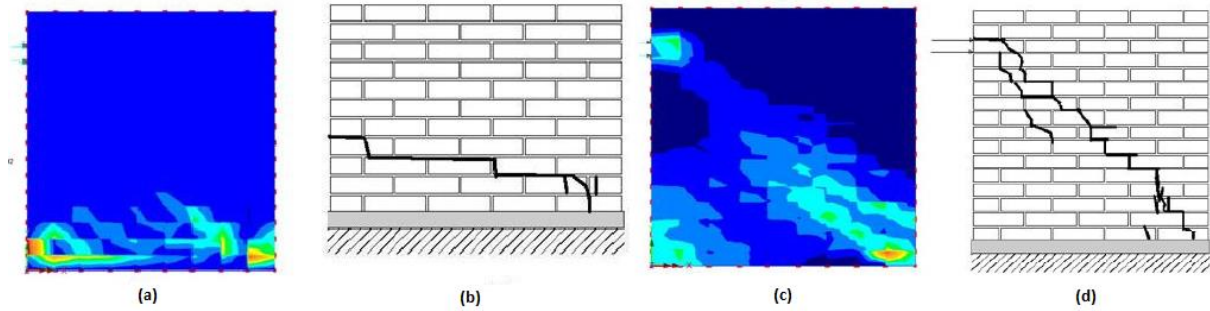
(a) maximum strain in URM (b) crack pattern experimental testing URM (c) maximum strain GFRP reinforced masonry (d) crack pattern experimental testing GFRP reinforced masonry [36]
